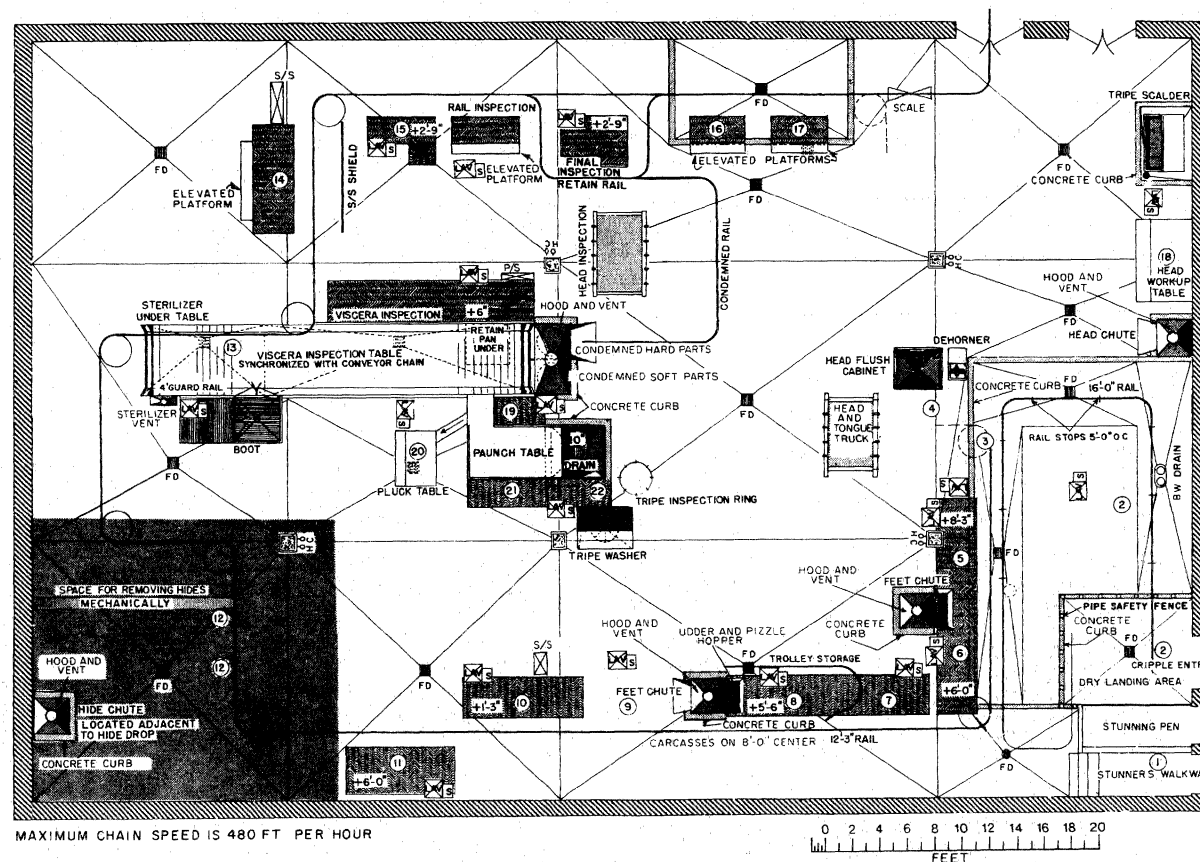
Sample layout of on-the-rail kill-floor facilities meeting Federal inspection requirements for a plant slaughtering 60 head of cattle per hour.
